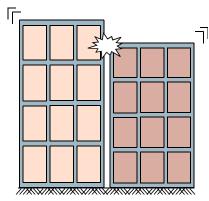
(a): Different Floor Height Buildings Suffer More in Pounding
